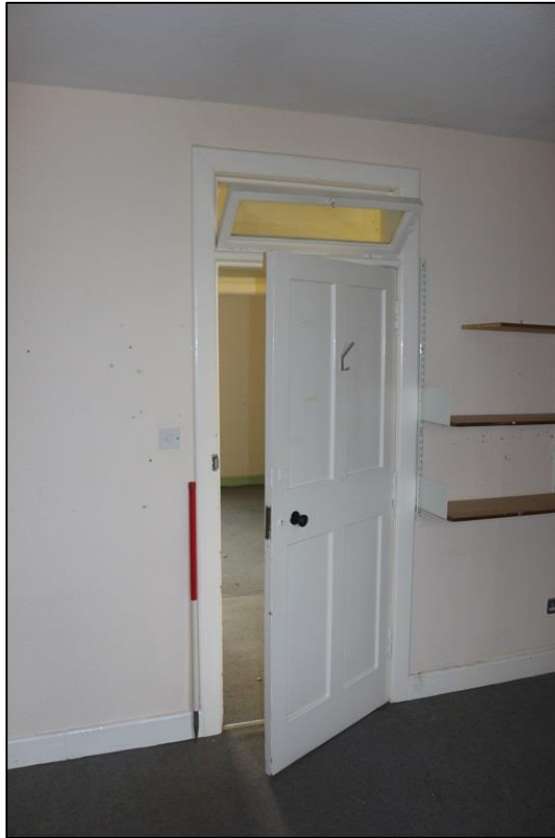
Social Care Building – Original Door and Rectangular Transom Light
